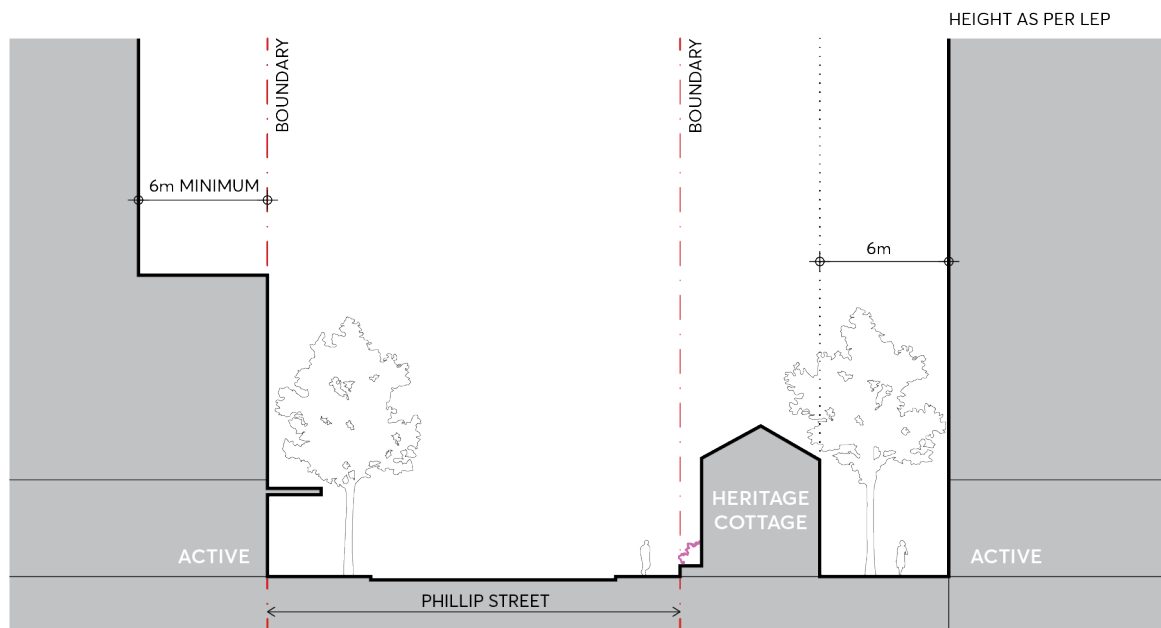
City East Block Phillip Street at 66 Phillip Street (Section C)
